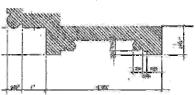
Detail photo (right), GWWO, 2005; and detail (above) of window/door trim and corner block found in room 101.
